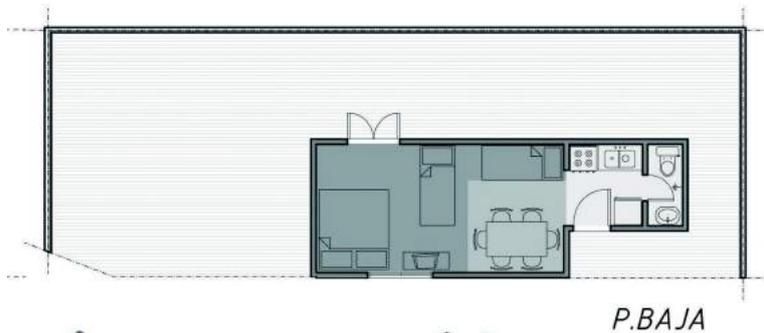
Plan 1: The original dwelling, 1985. The family completed the first stage of building the house, with a bathroom and a kitchen-diner (marked in light grey) and a single room that was used as a bedroom (dark grey) and living room (medium grey).
